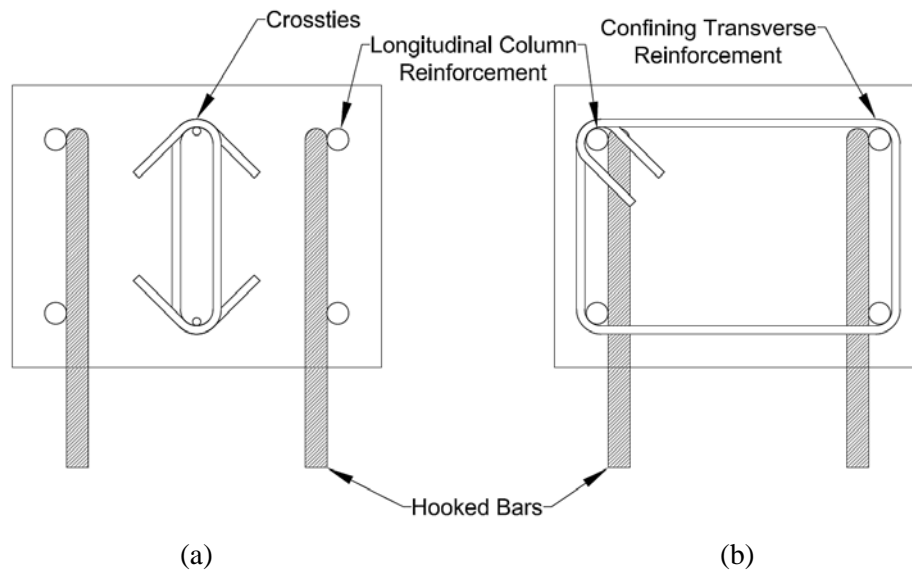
Cross-section of specimens (a) with cross-ties and no confining transverse reinforcement and (b) without cross-ties and with confining transverse reinforcement
